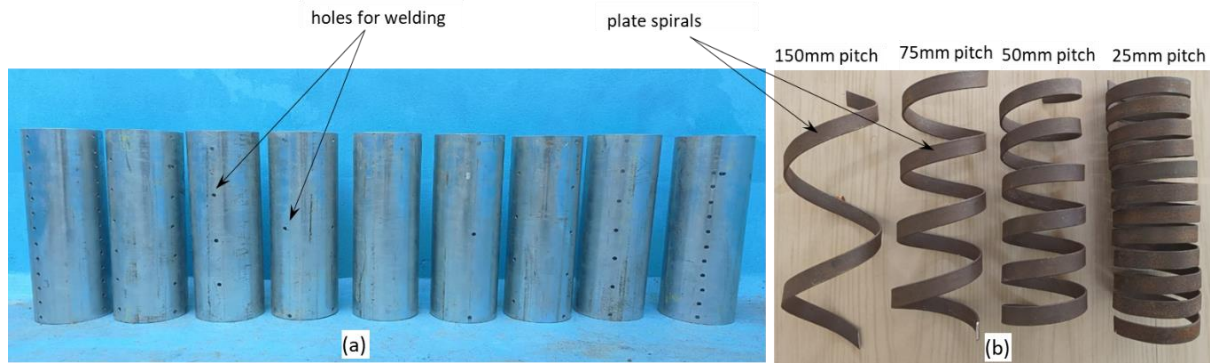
Fabrication details of specimens (a) Steel tubes having weld holes (b) Plate spirals
